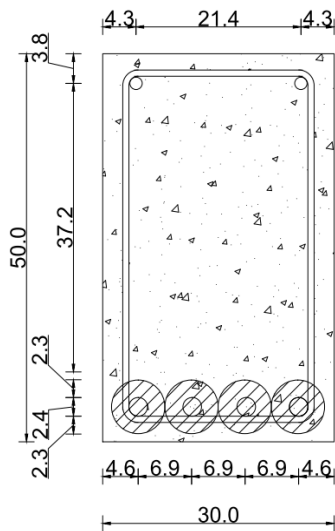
Proposed effective reinforced concrete section in the tension zone designated as proposed approach min.
